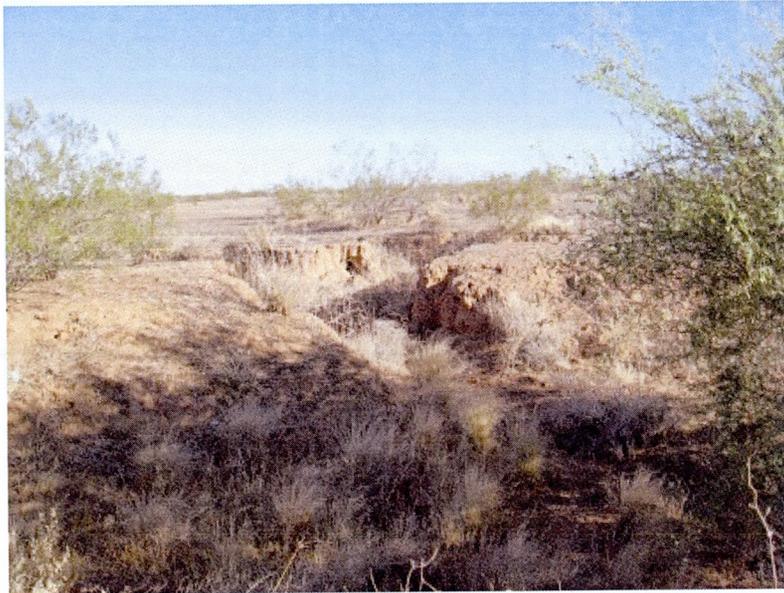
From shoulder of North side of Happy Valley Road looking NE up drainage into culvert in 244 above.
